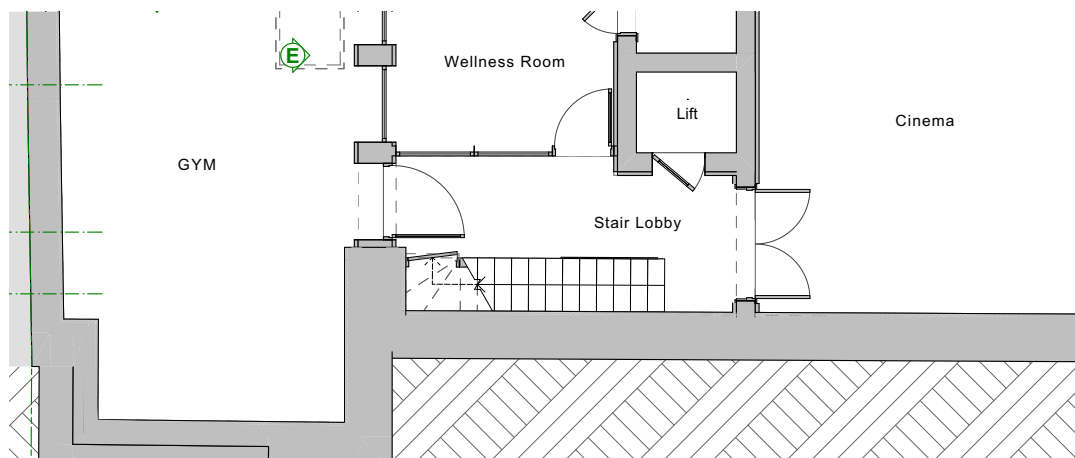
Partial Floor Plan of Proposed Scheme
